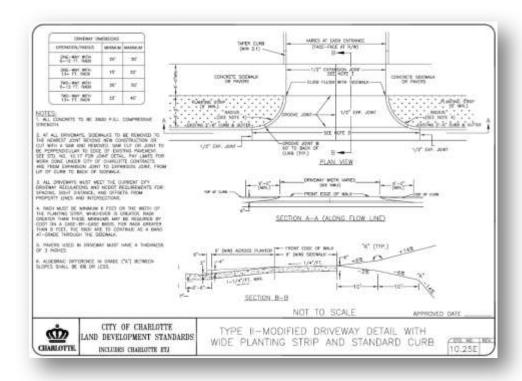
Commercial Type II - Modified Driveway w/ Planting Strip
